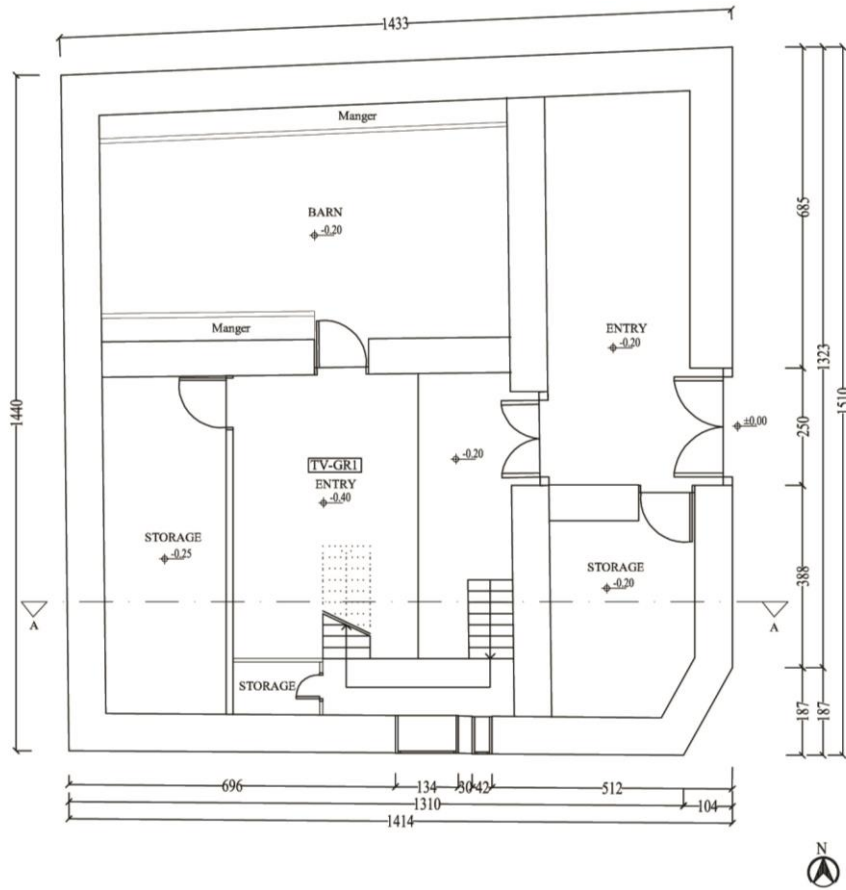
Ground floor plan of Tahtacıörencik Village House in 1/100 scale (Drawn by author).
